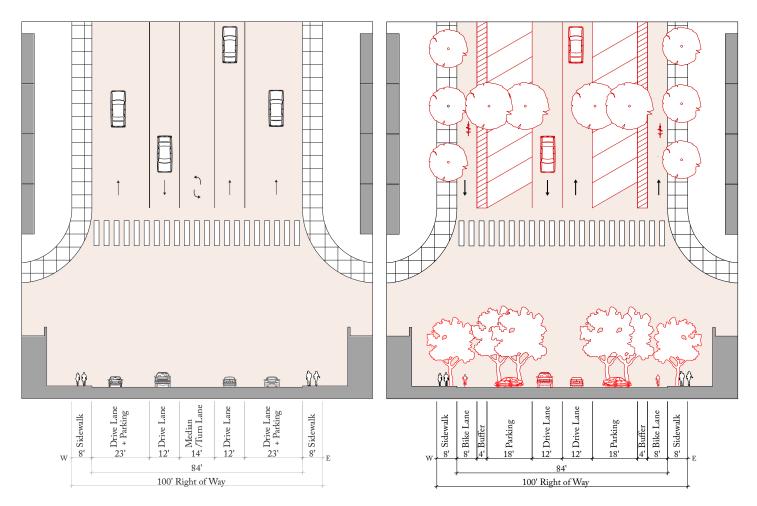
Existing (left) and Proposed (right) Whittier Boulevard, West of Spruce Street.
